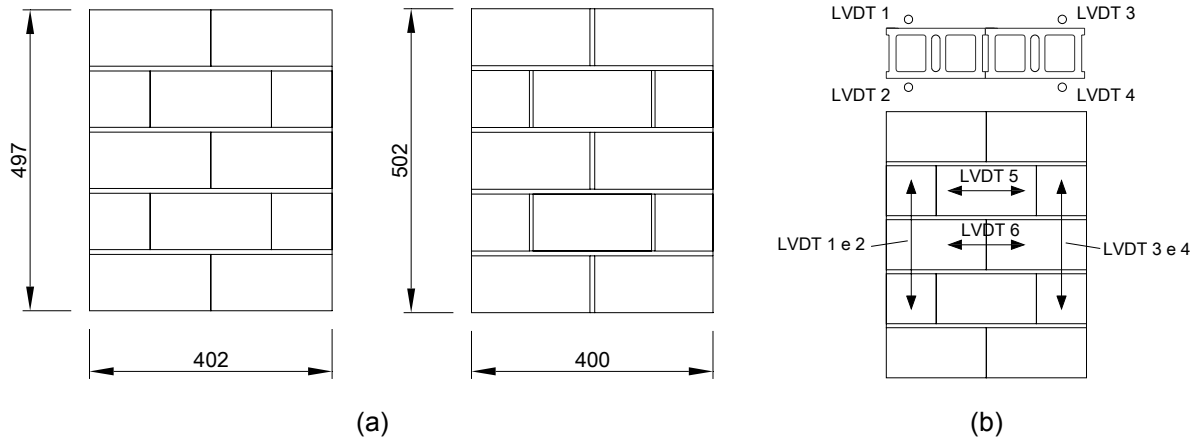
Specimens used in compressive tests normal to bed joints: (a) geometry and (b) instrumentation.
